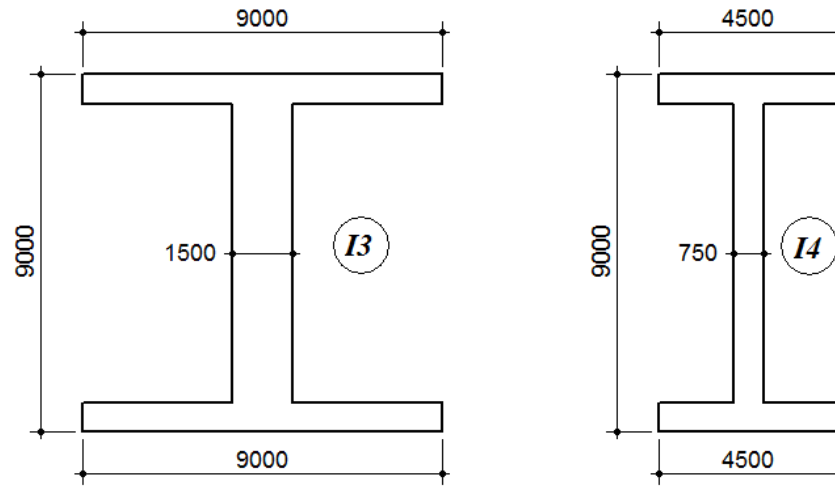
Flanged section core walls considered in the present example (Left: Section *I3*, Right: Section *I4*).
